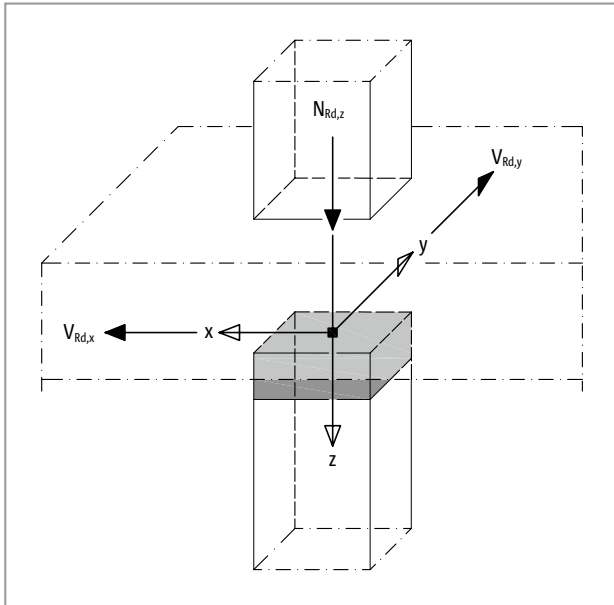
Schöck Sconnex® type P: Sign convention for the design
